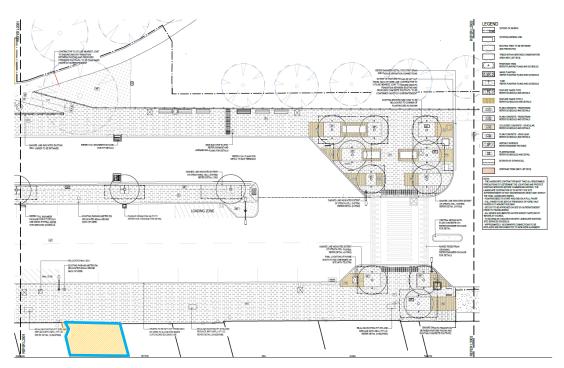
Extract of General Arrangement Sheet 2, showing the extent of the proposed works. The Bogey Hole Café (item no. I279) is indicated in blue (Source: Group GSA, General Arrangement Sheet 2, L2002 F 19/10/2018).
